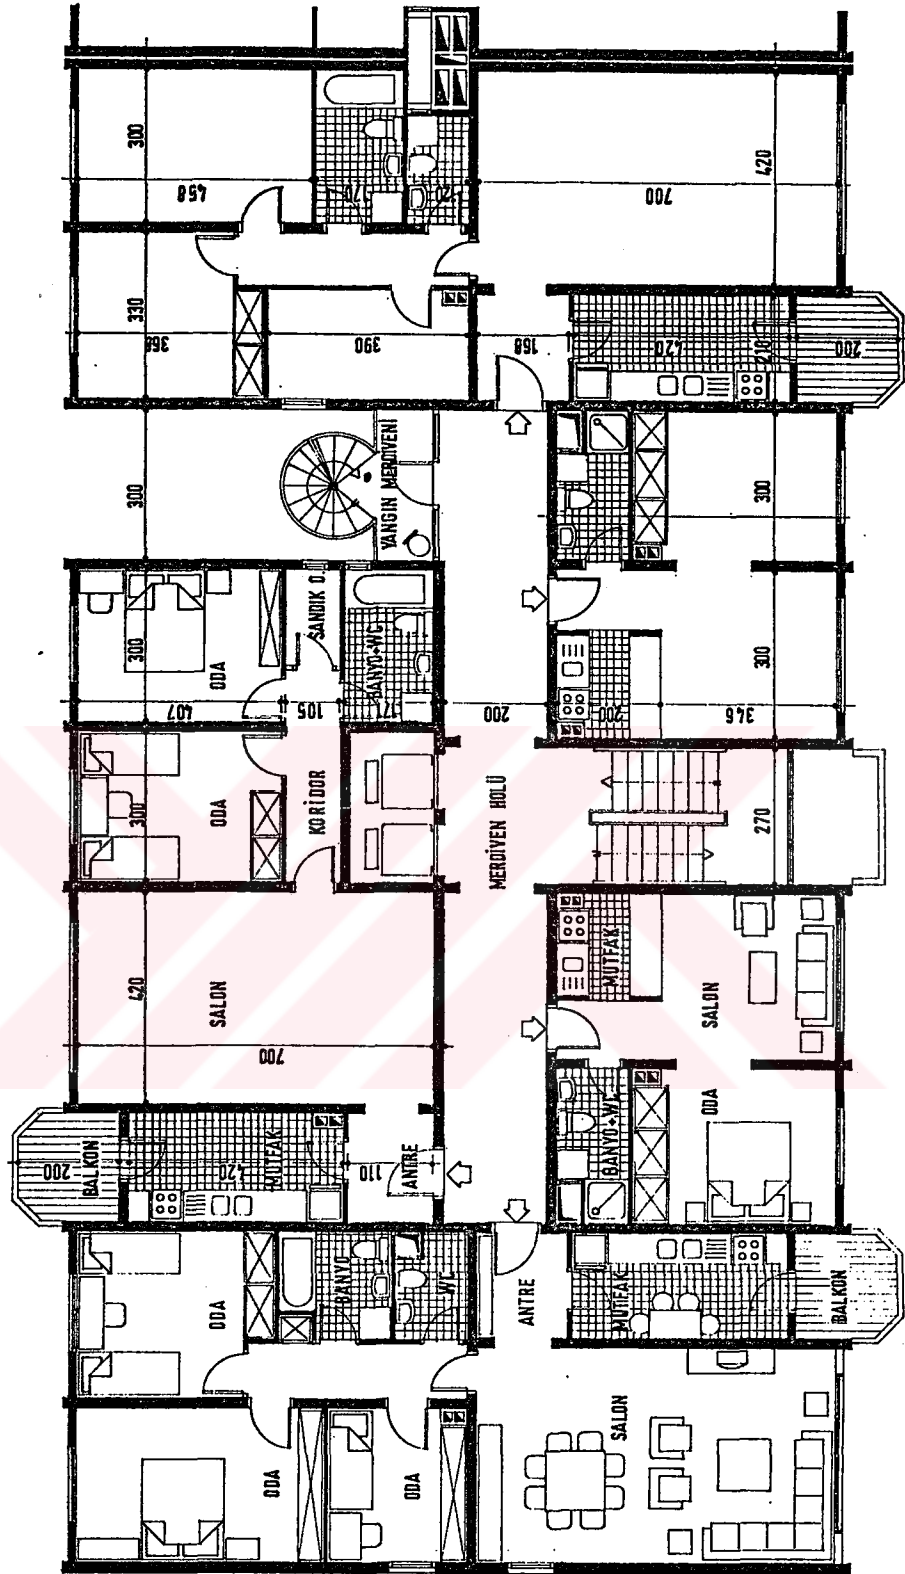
Typical Floor Plan of the Dwellings of Ataköy
